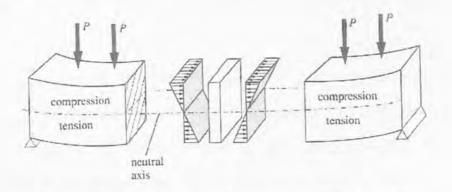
Stresses due to bending in a beam (O'Brien, 1995)
